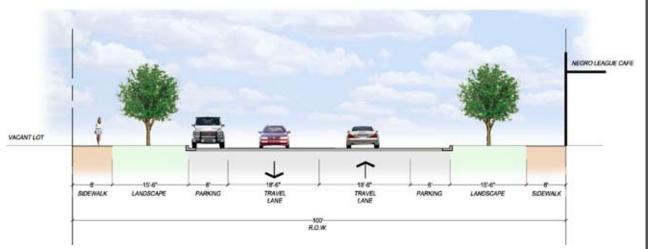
Existing Typical Section of Prairie Avenue between 42nd Street and 44th Street
